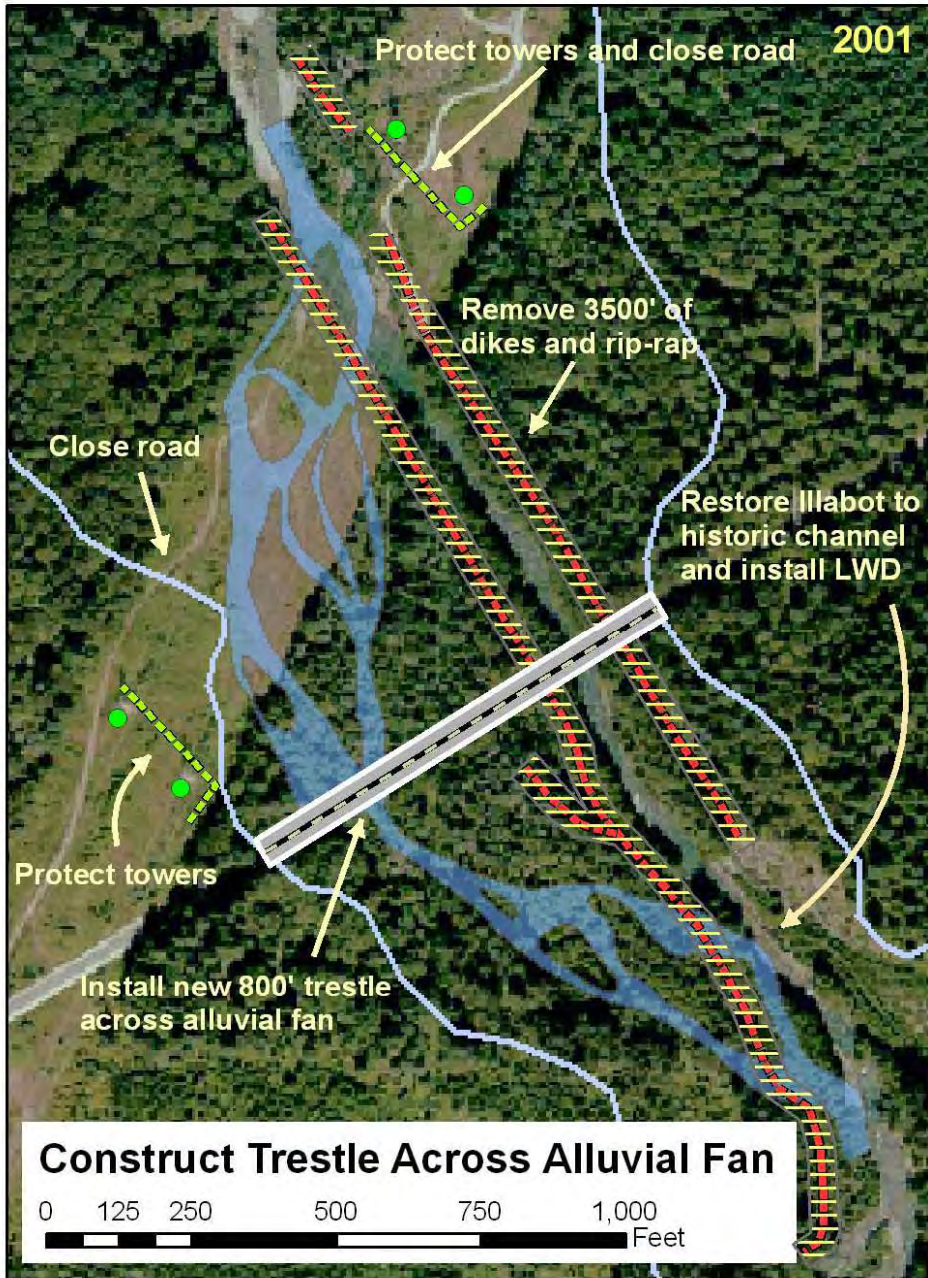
Maps detailing Alternative 1, constructing a trestle across the fan and closing Rockport-Cascade Road
